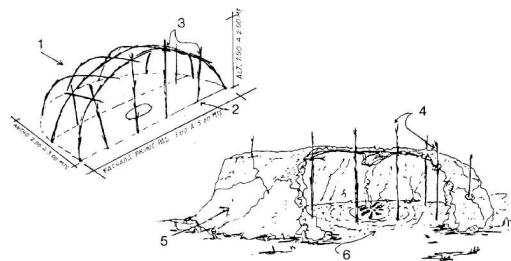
Constructive system of an Aonikenk dwelling. Baeriswyl, 1991
